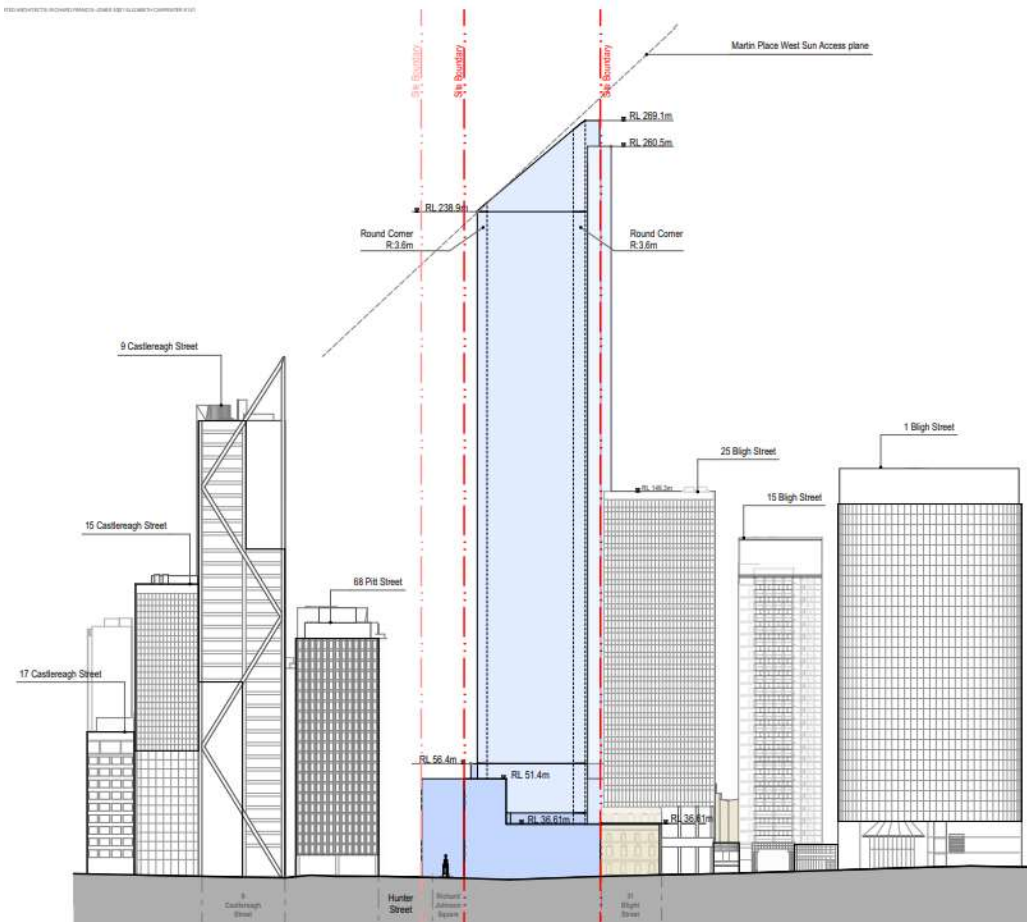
East elevation of Hunter Street East planning envelope. Source: FJMT Studio, 2021.
